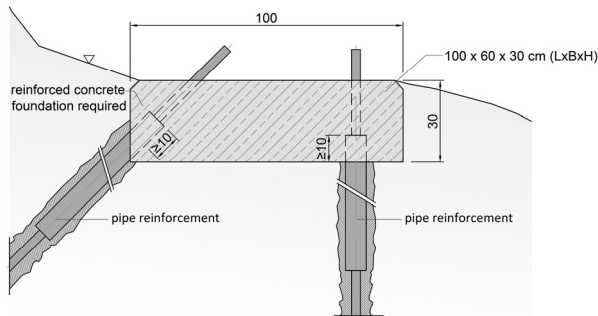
Recommended execution of a post foundation with a reinforced concrete foundation and pipe reinforcement on the micropiles.
